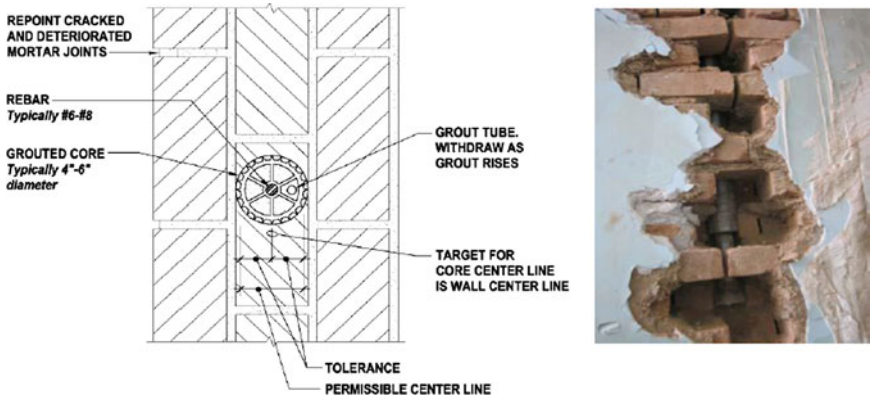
Left: Plan detail of center core method in masonry wall, Right: Applying vertical perforations in masonry walls [12]
